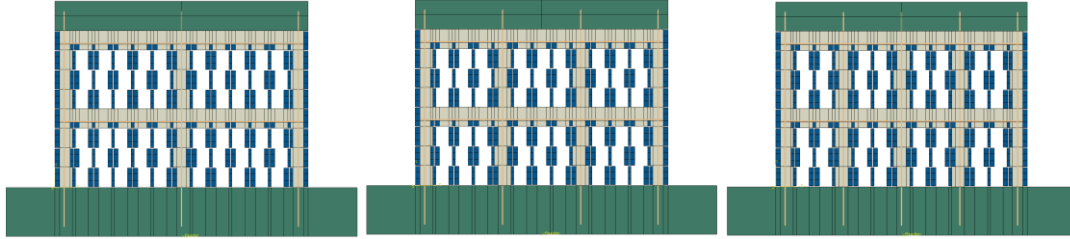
Grout Core Spacings (1.6 m Wall Height)
